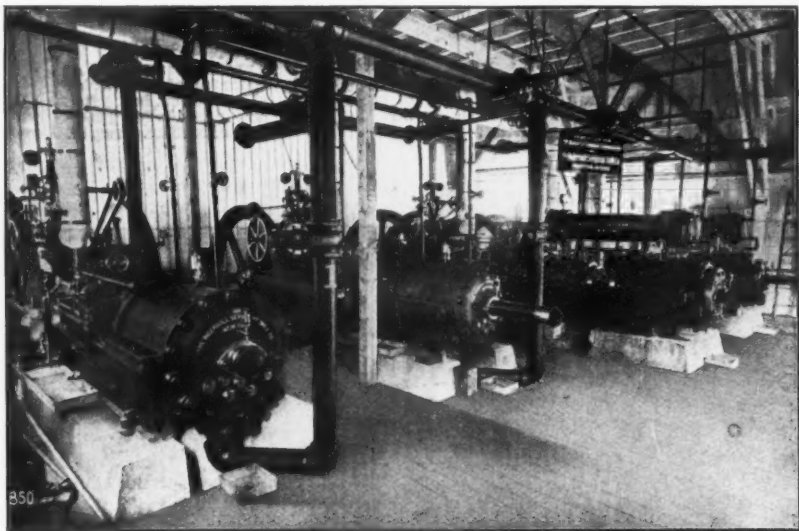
COMPRESSOR PLANT, SECTION "C," BOSTON TRANSIT COMMISSION.
